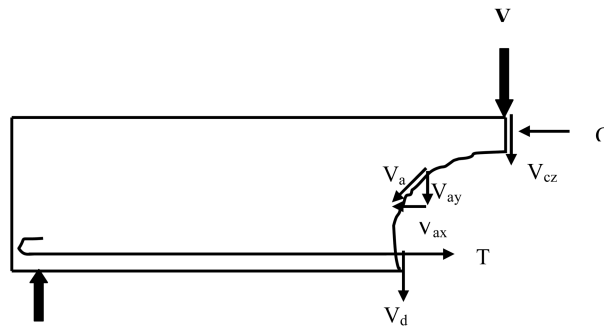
Internal forces in a cracked beam without stirrups
